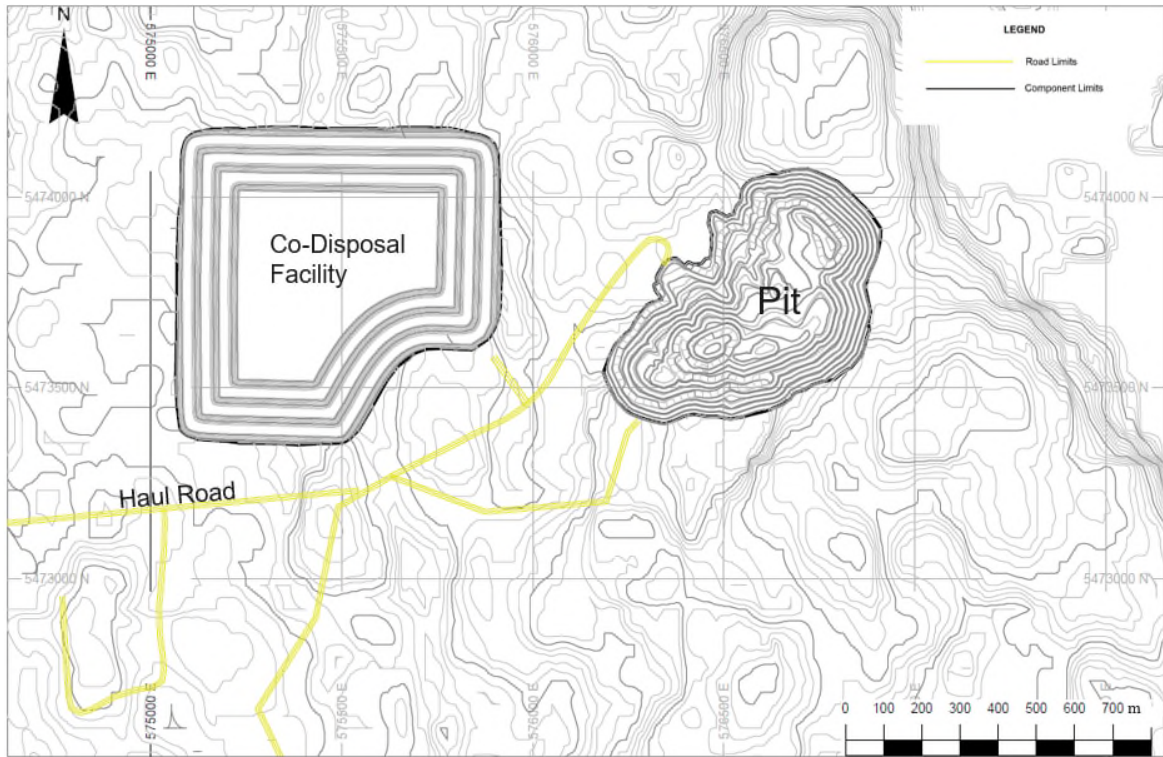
General arrangement of the mine site layout for Raleigh Lake showing the final open pit (right) and co-disposal facility (left).
